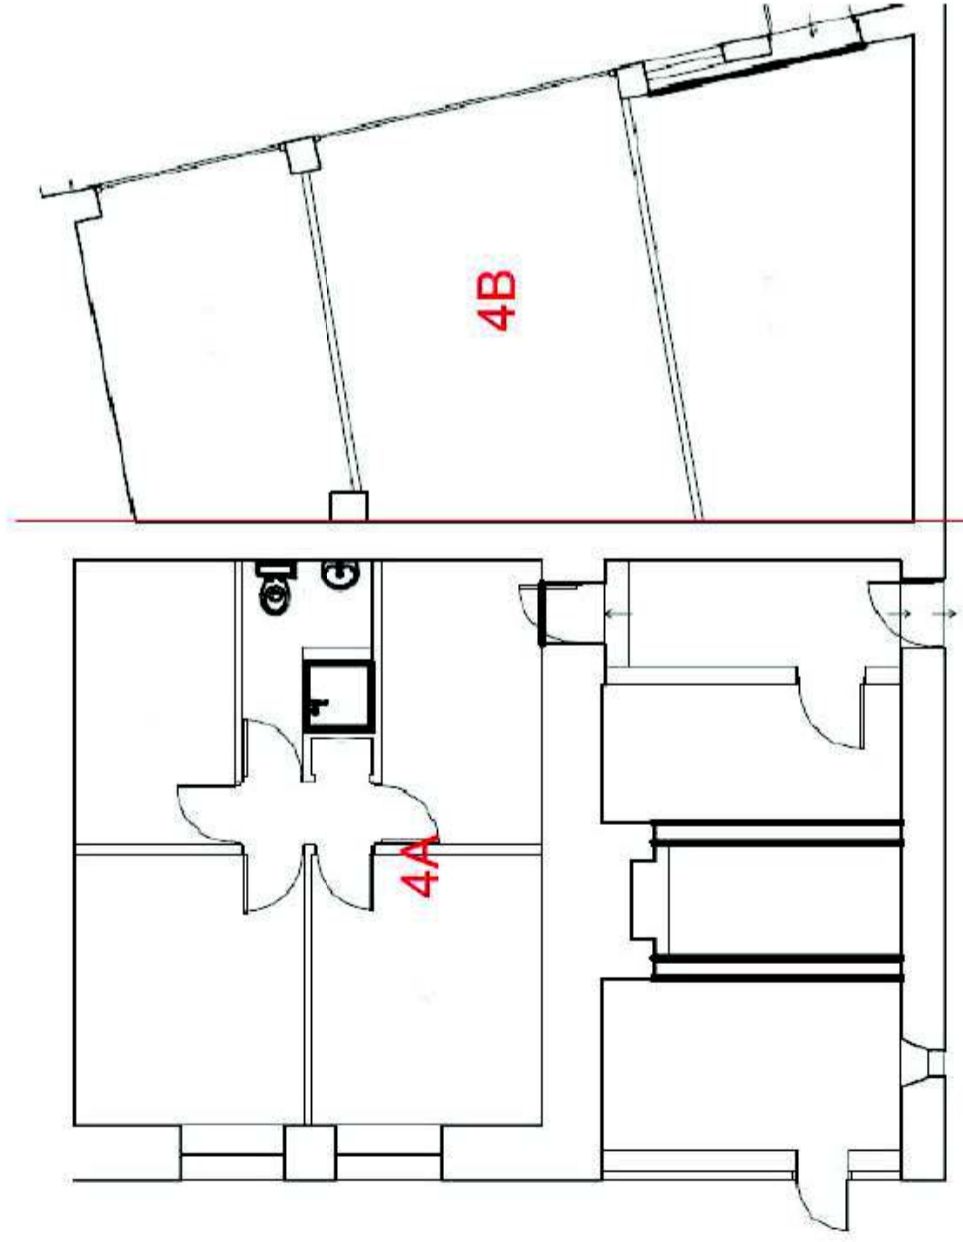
First Floor Plan, building 3, 1:100 @ A3
